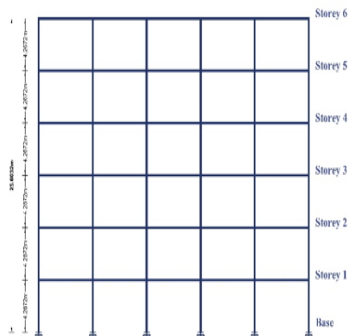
Elevation of Rectangular Model A (RM-A)
